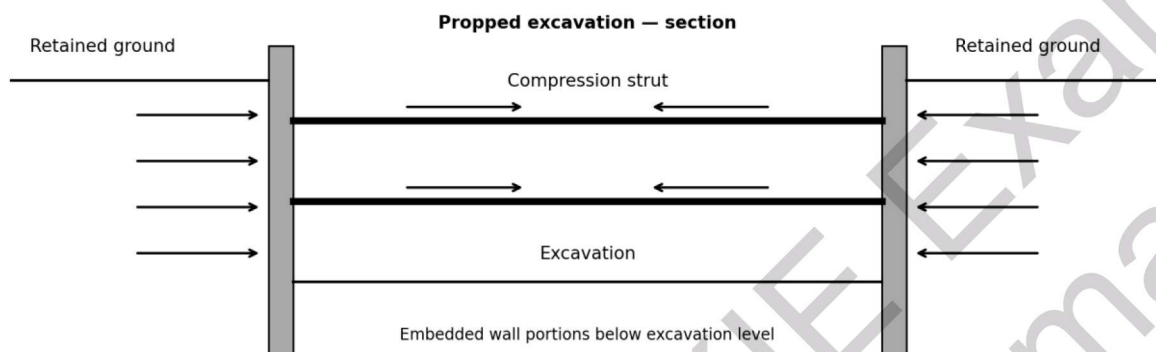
Conceptual propped excavation section. Struts act in compression; retained soil and water load the walls towards the excavation. Toe resistance is not shown.
